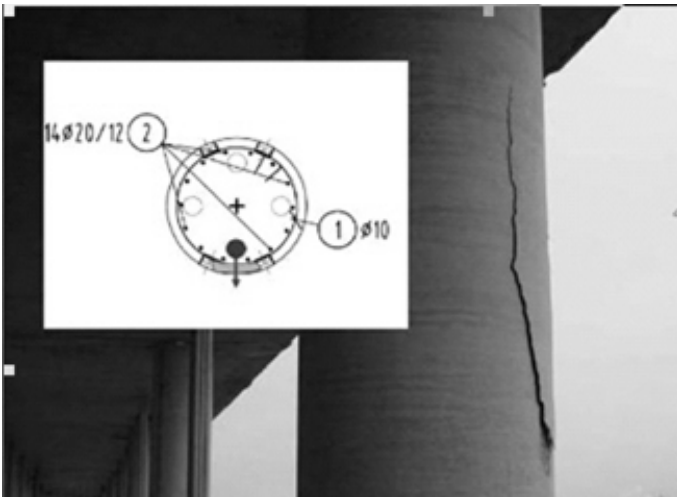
Photo of a column with spalling and a sectional view of the column.
